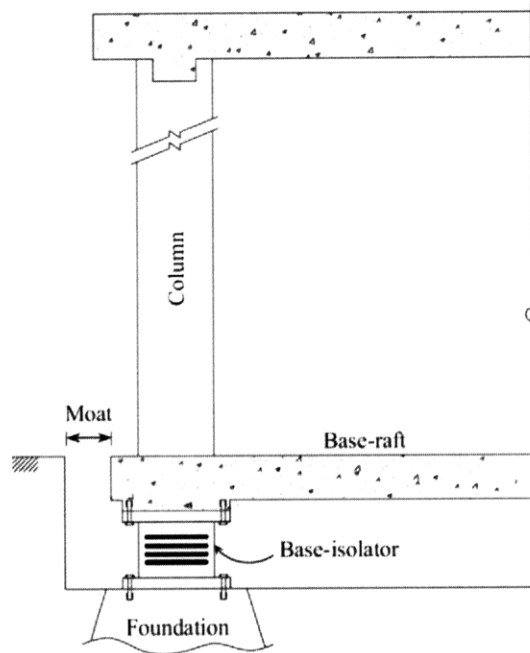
Details of base isolated concrete frame structure (Matsagar and Jangid, 2008)
